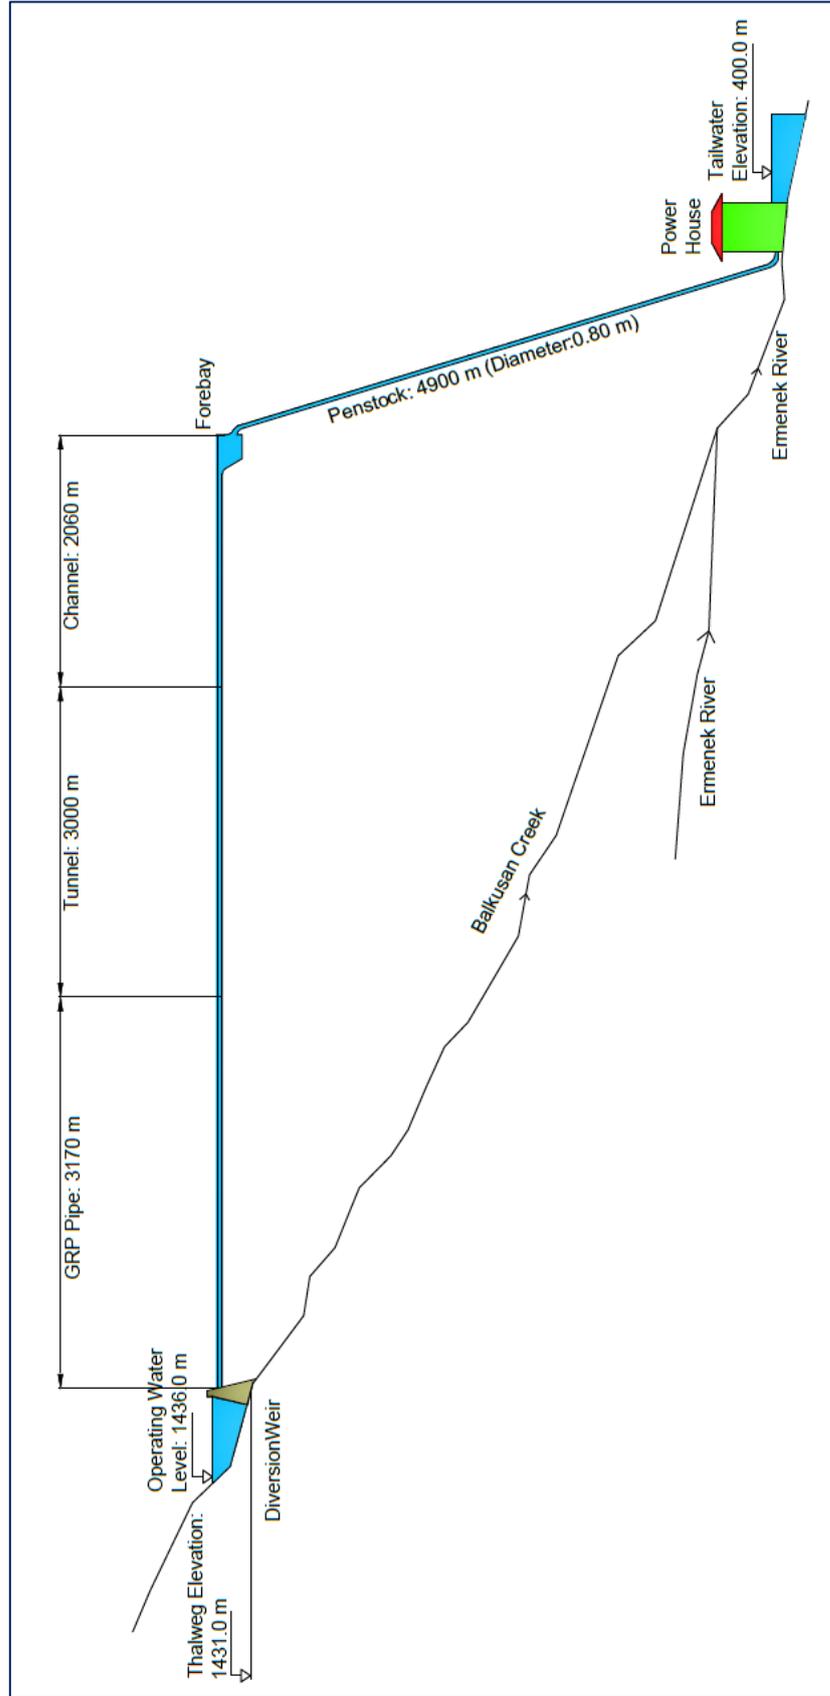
Plan of the Alternative-formulation (Not to Scale)
